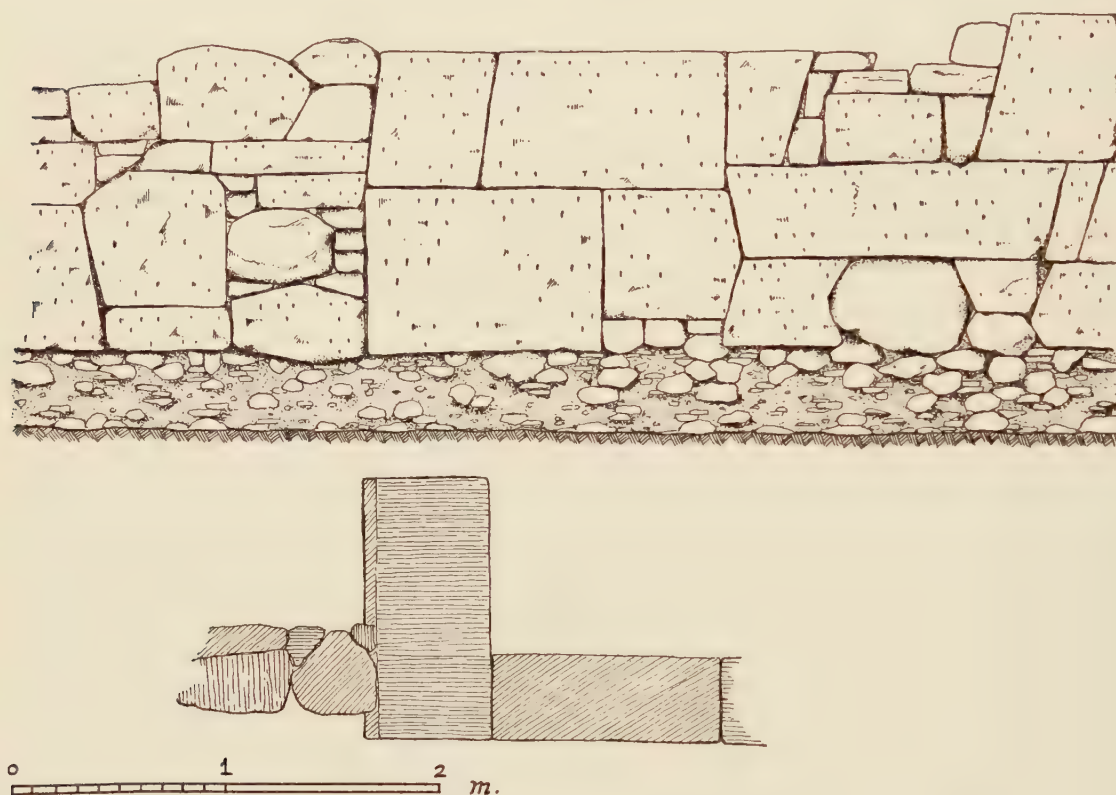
East Wall of Drain in Front of House L: Elevation and Plan.
